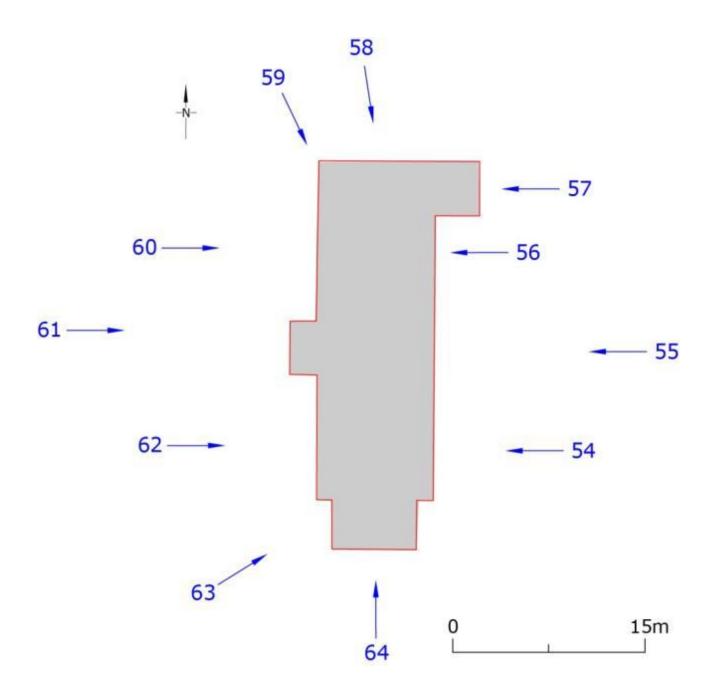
Location and direction of exterior shots of Building 45 (YMCA Building).
